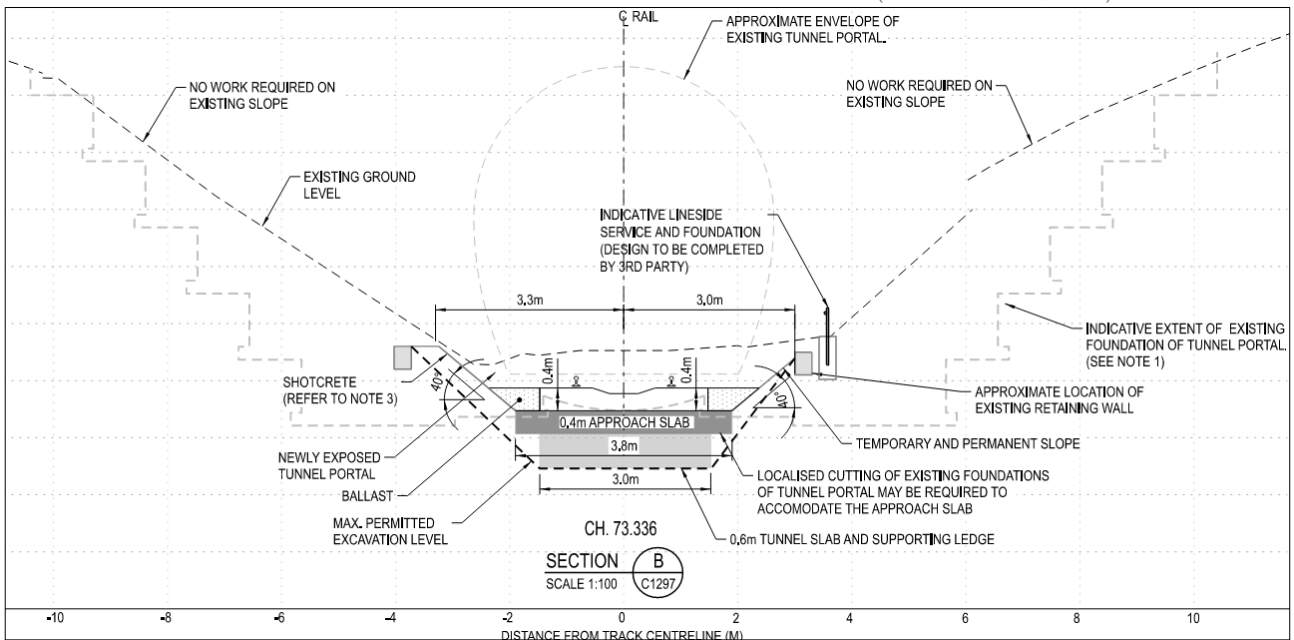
TYPICAL SECTION AT CH. 73.336 SHOWING RETAINING WORKS AT DOWN-END PORTAL (SOURCE: AURECON/VLINE)
